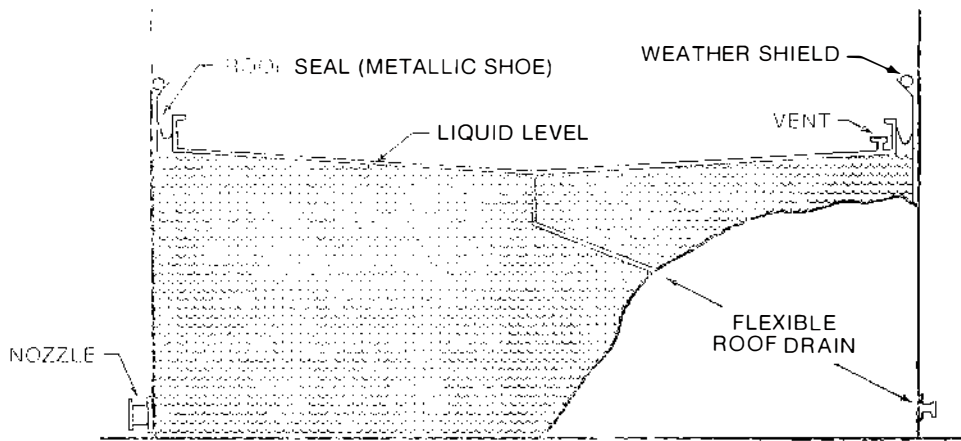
Pan-Type Floating Roof Storage Tank (Metallic Seals).
